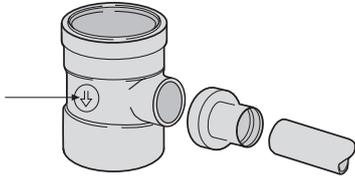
123.4 Single Bossed Pipe Connector (spigot boss)
